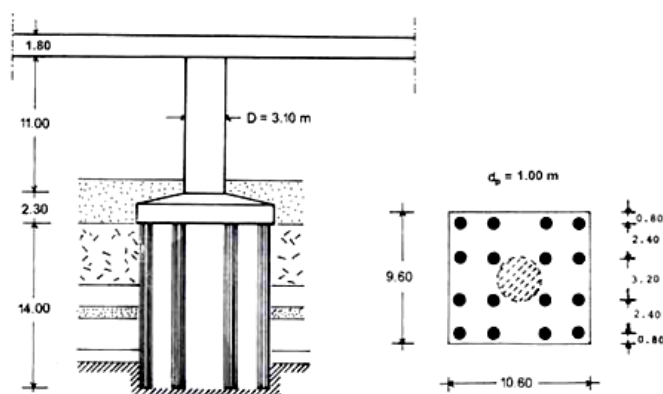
Geometric characteristics of typical collapsed pier in Fukae section
